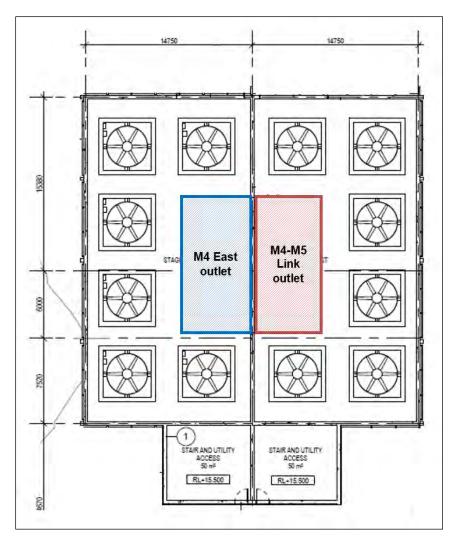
Eastern ventilation facility - plan view showing fan layout and outlets
